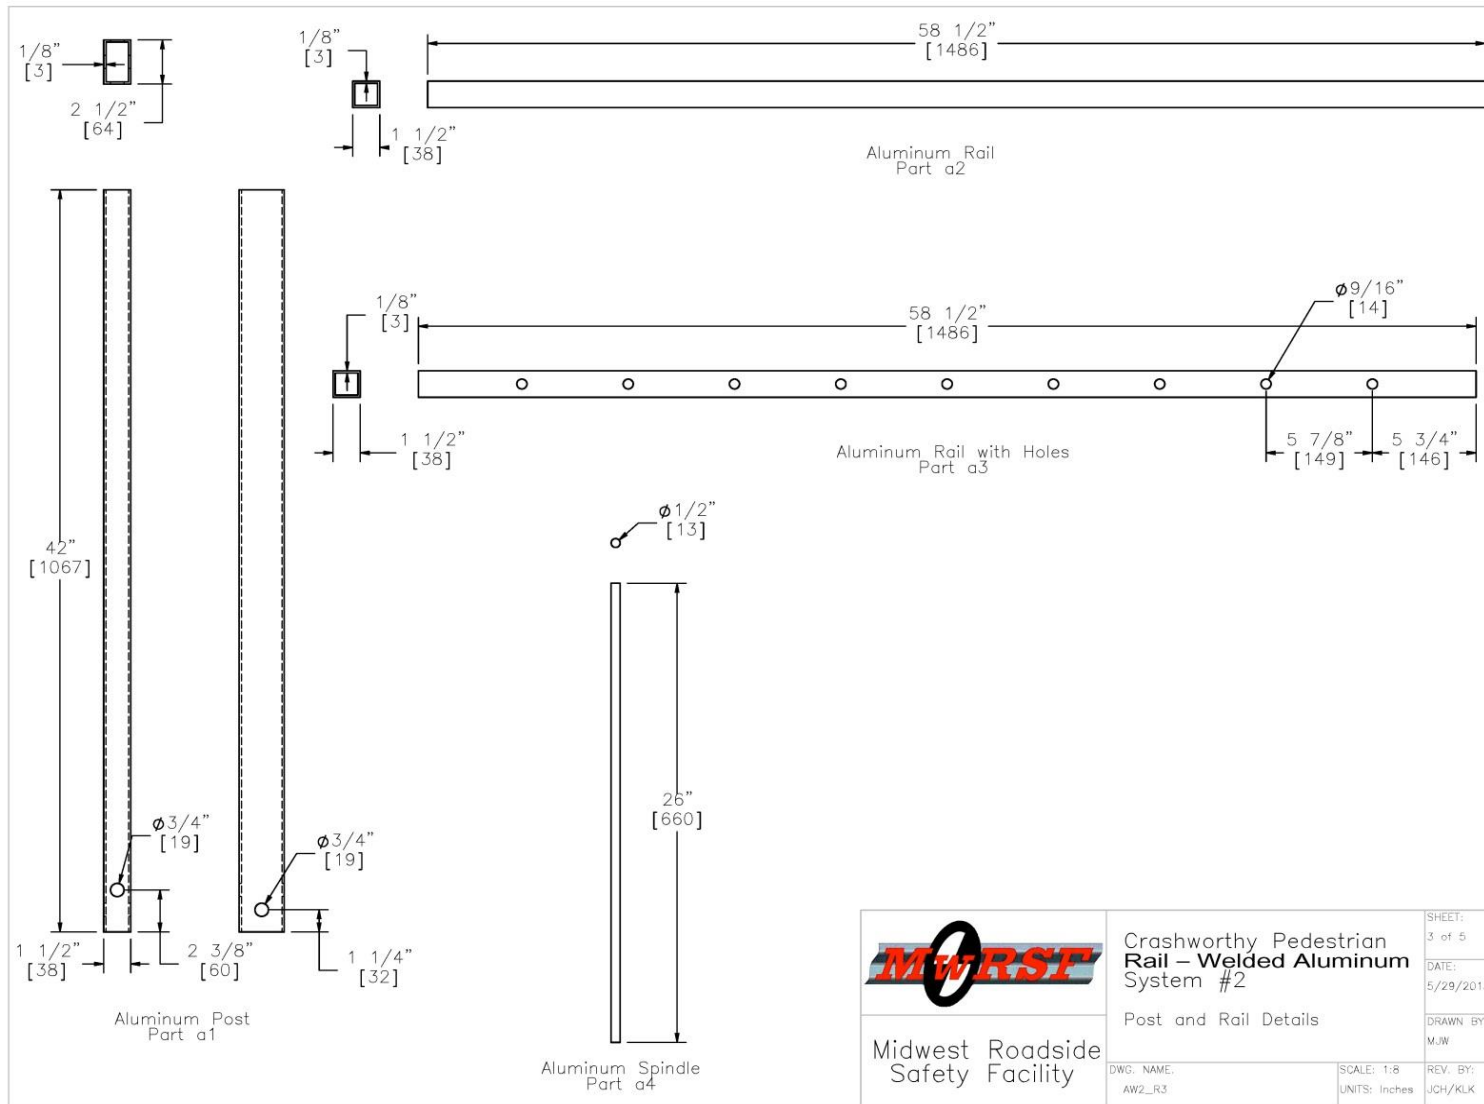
Welded Aluminum Rail, Design Concept AW2 (Sheet 3 of 5)
